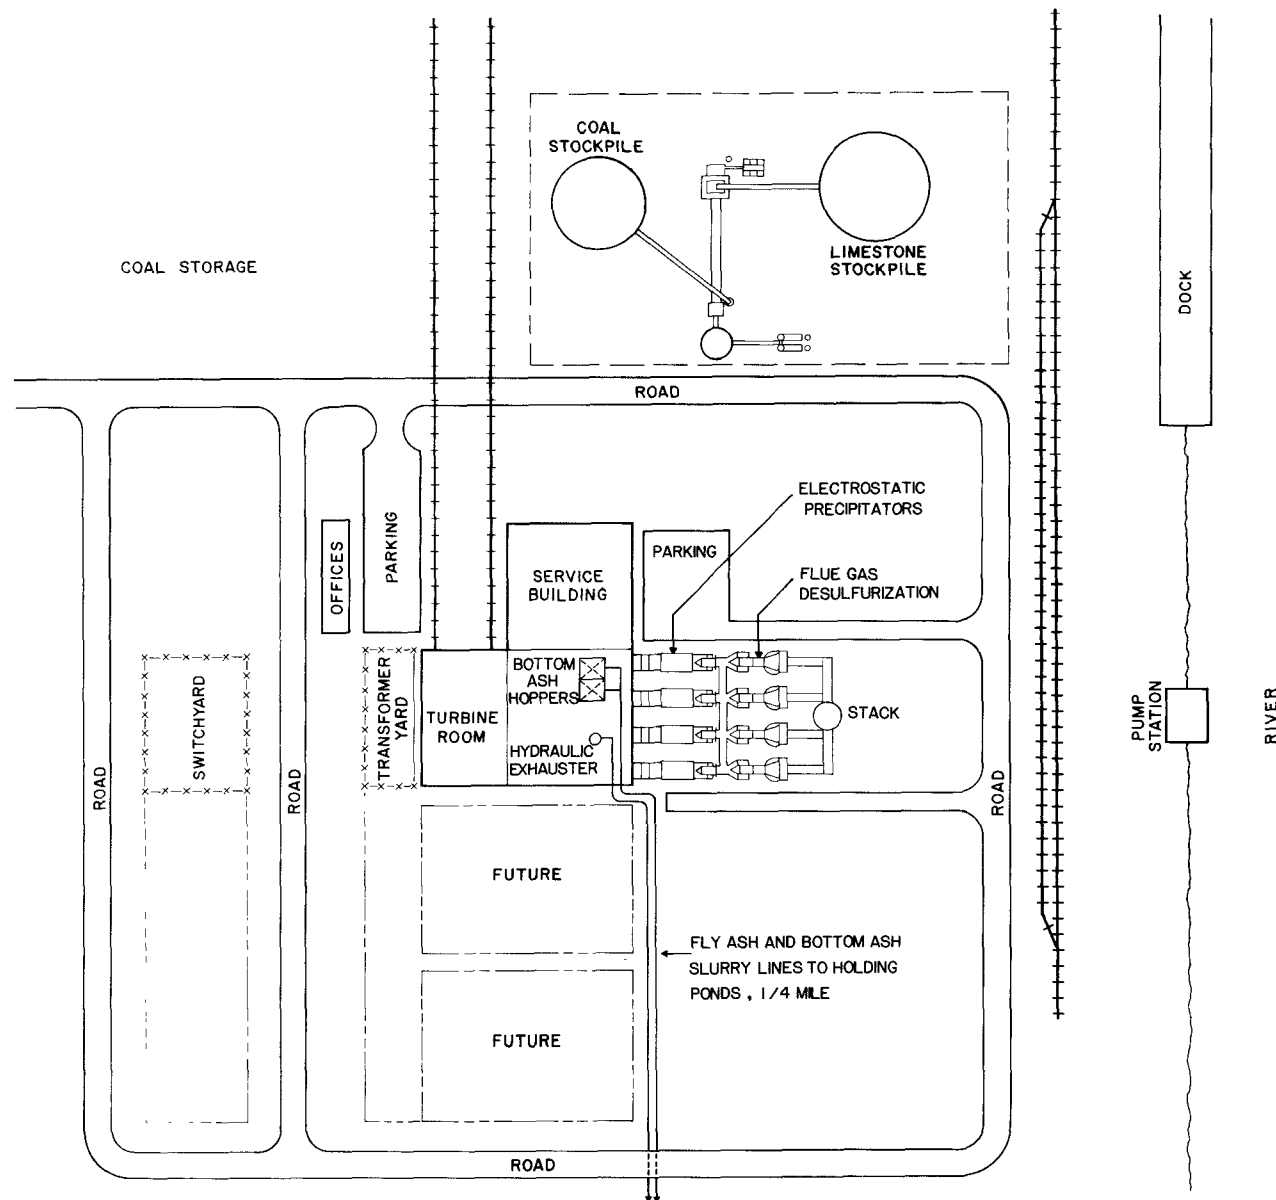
Plot plan. Base case 3, holding ponds and landfill for nonhardening ash.
